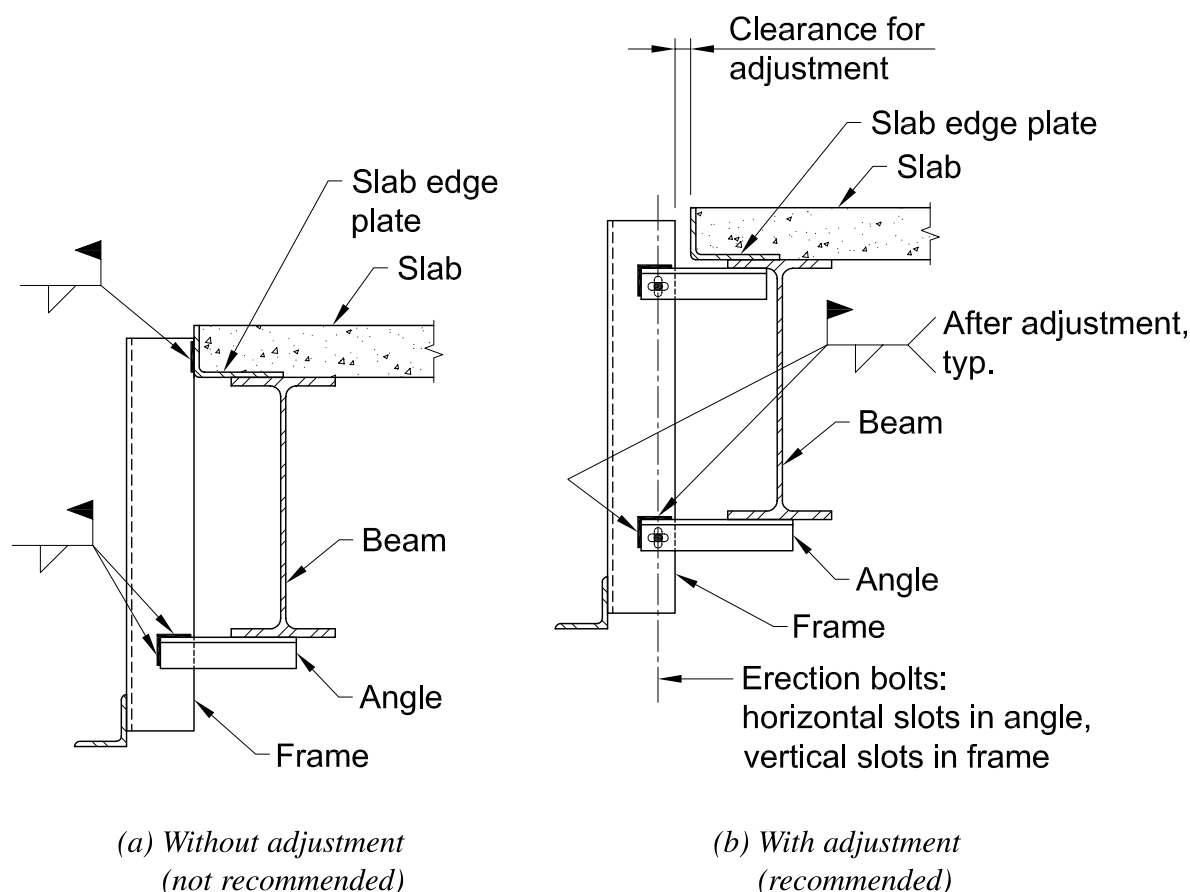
Attaching masonry façade systems to structural steel framing.
